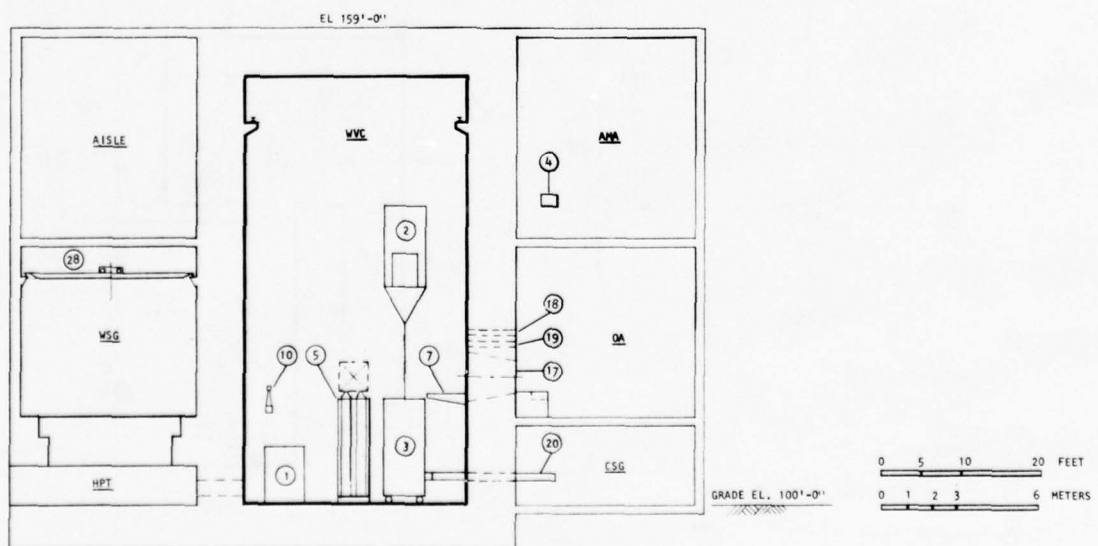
Waste Vitrification Process Equipment Arrangement, Section B-B
